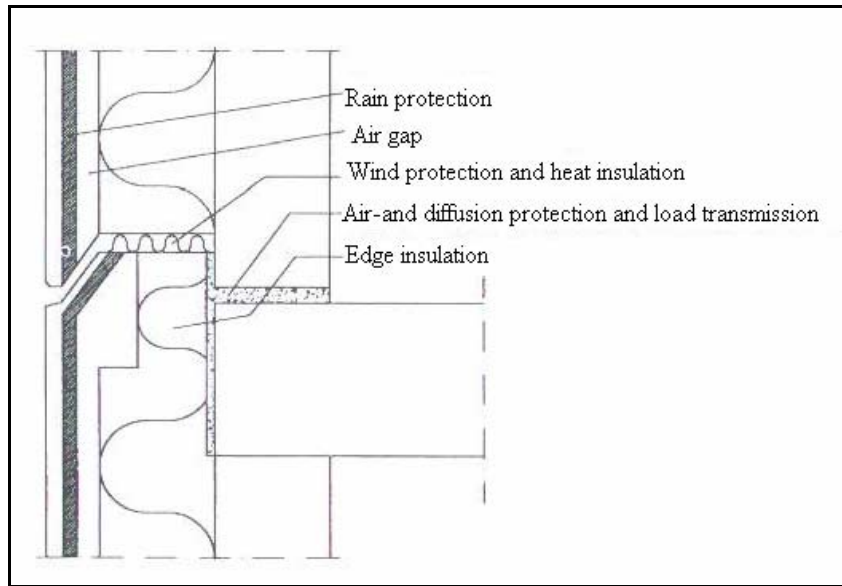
Building envelope consisting of sandwich element precast wall. [28]
